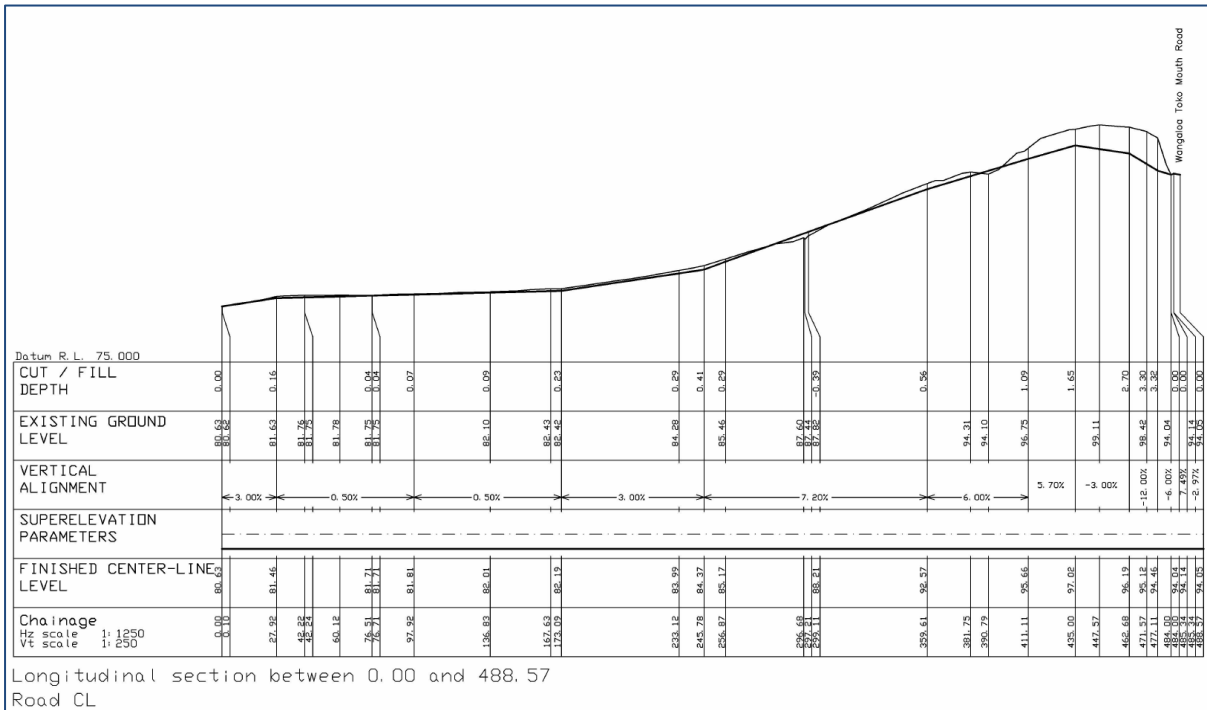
Longitudinal section of the proposed road to vest. Intersection with Coast Road at the far right of the figure.
